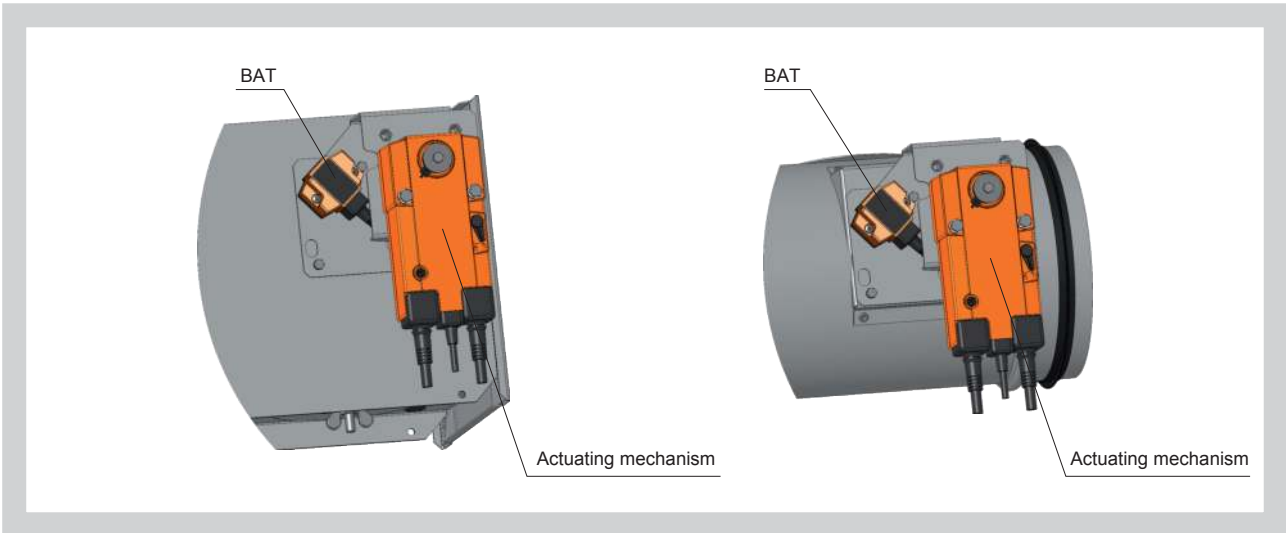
Actuating mechanism BELIMO BFL, BFN 230-T
